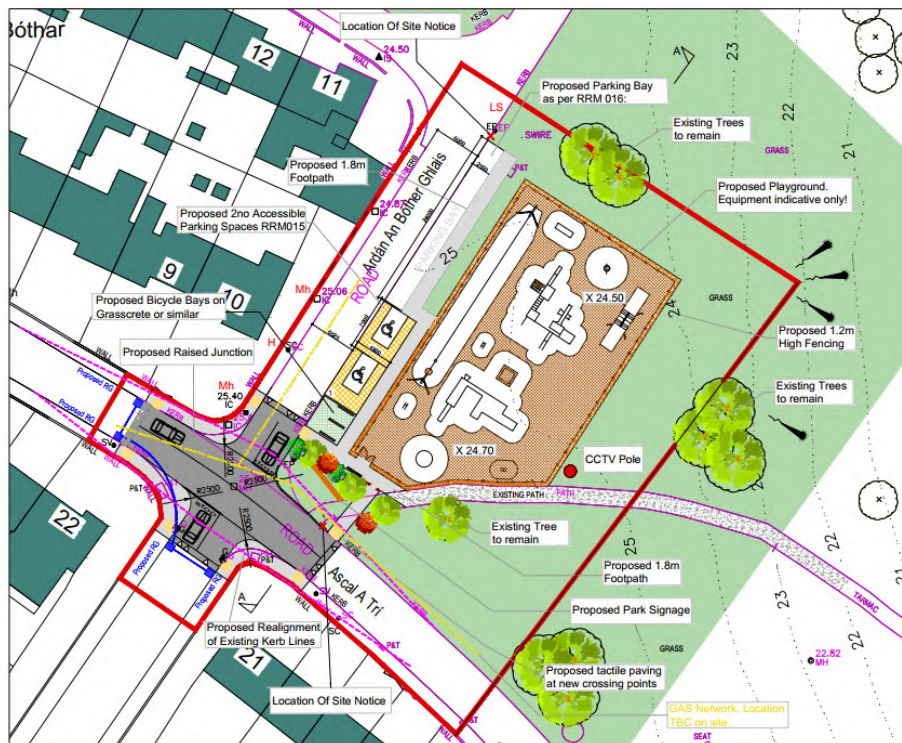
Extract of Figure 12 showing the proposed site layout for the playground and the surrounding ancillary works
